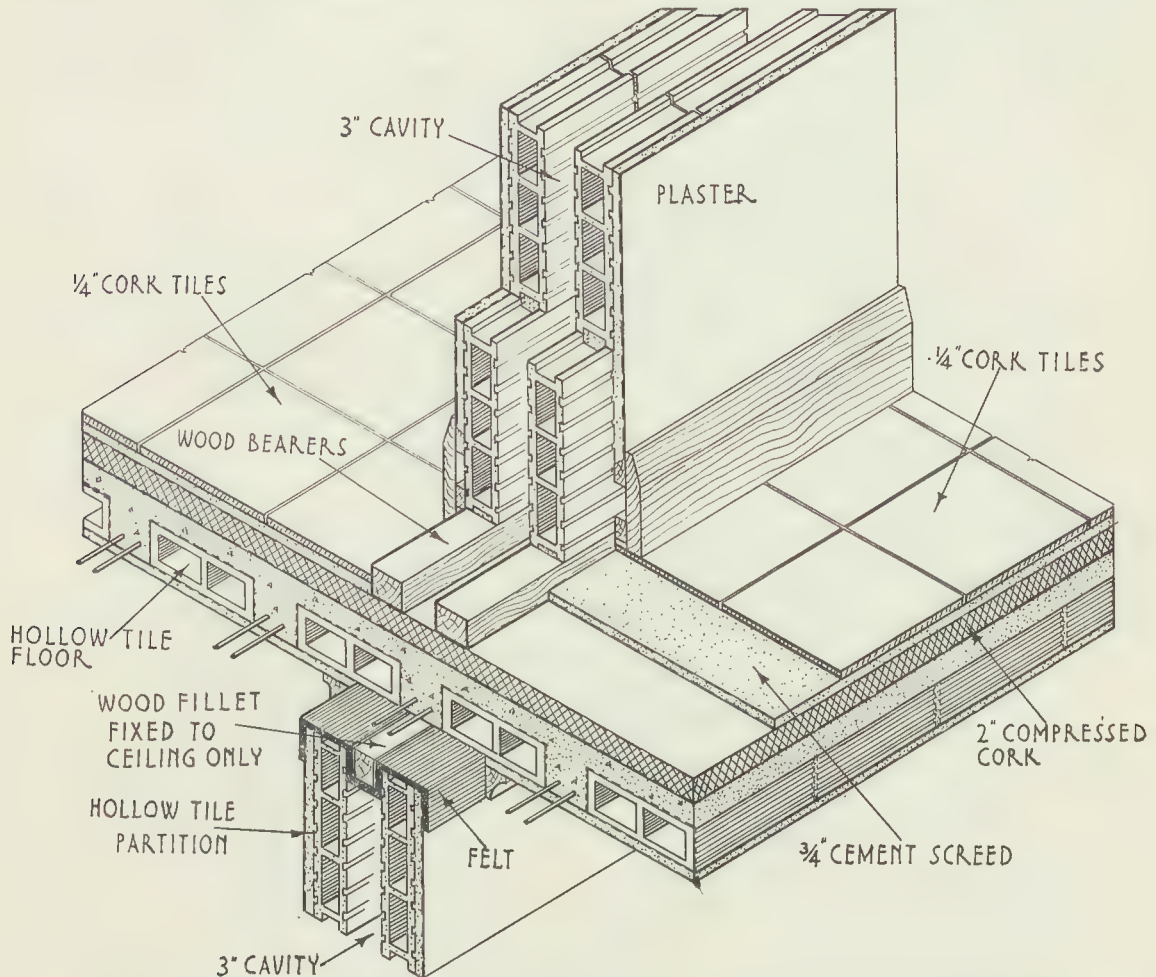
SOUND-PROOFING FLOORS AND HOLLOW BLOCK CAVITY PARTITION WALL
